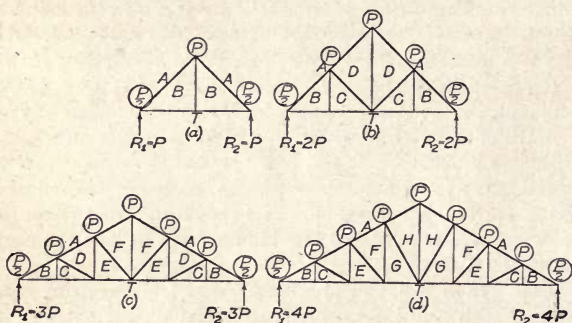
A. — (a) King Truss: (b) (c) (d) Queen Trusses.
